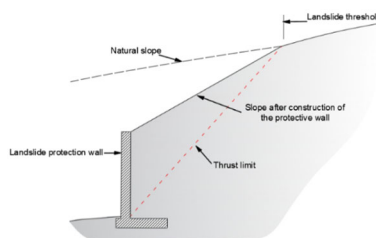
Reinforcement of the slope with the help of a wall (Source compiled by the authors).
